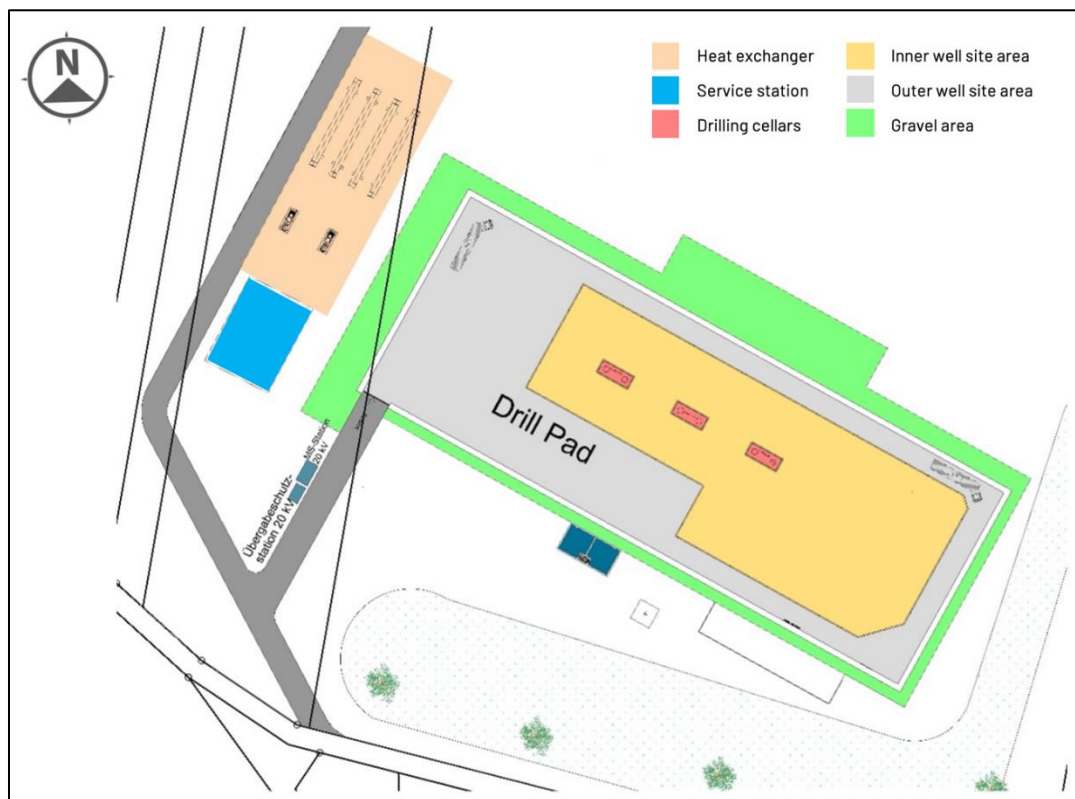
Standardised North Aligned Layout Overview of a Well Site
